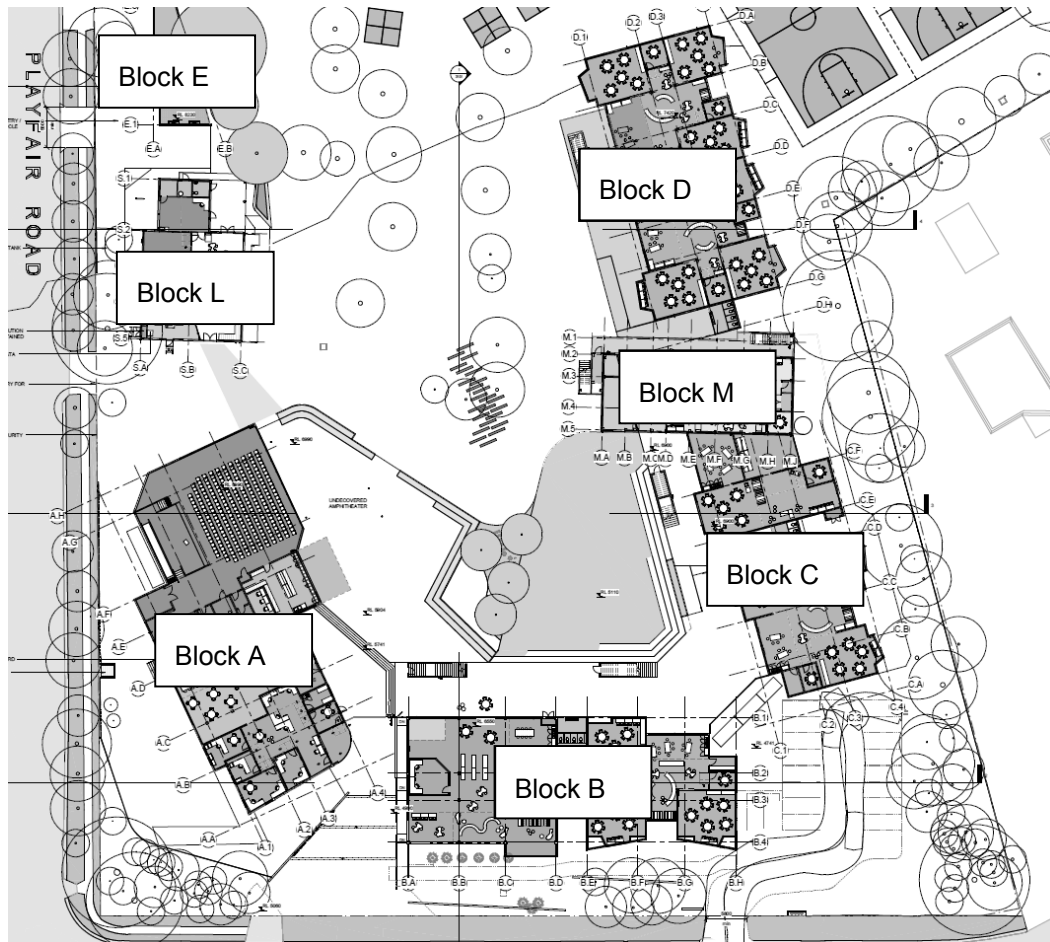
Schematic plan view of the ground floor with the building designations overlaid
